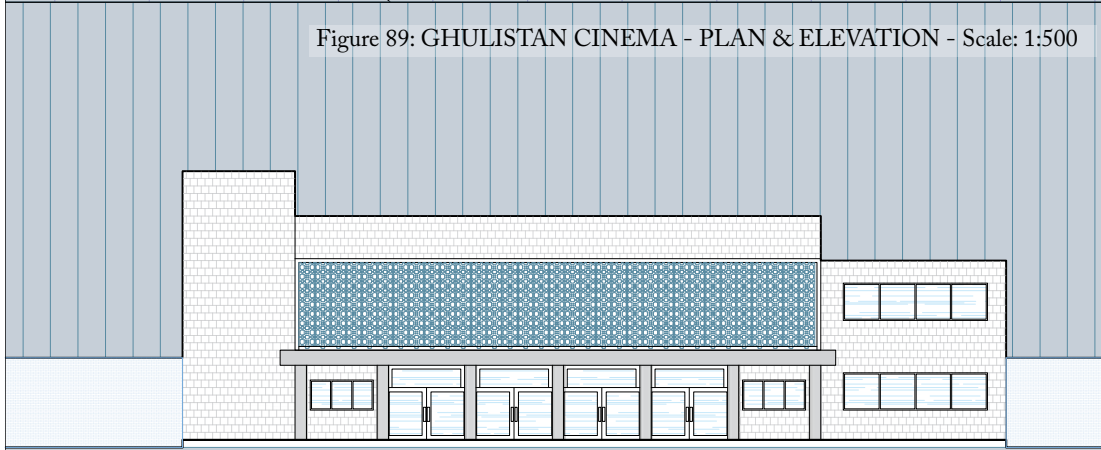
GHULISTAN CINEMA - PLAN & ELEVATION - Scale: 1:500
